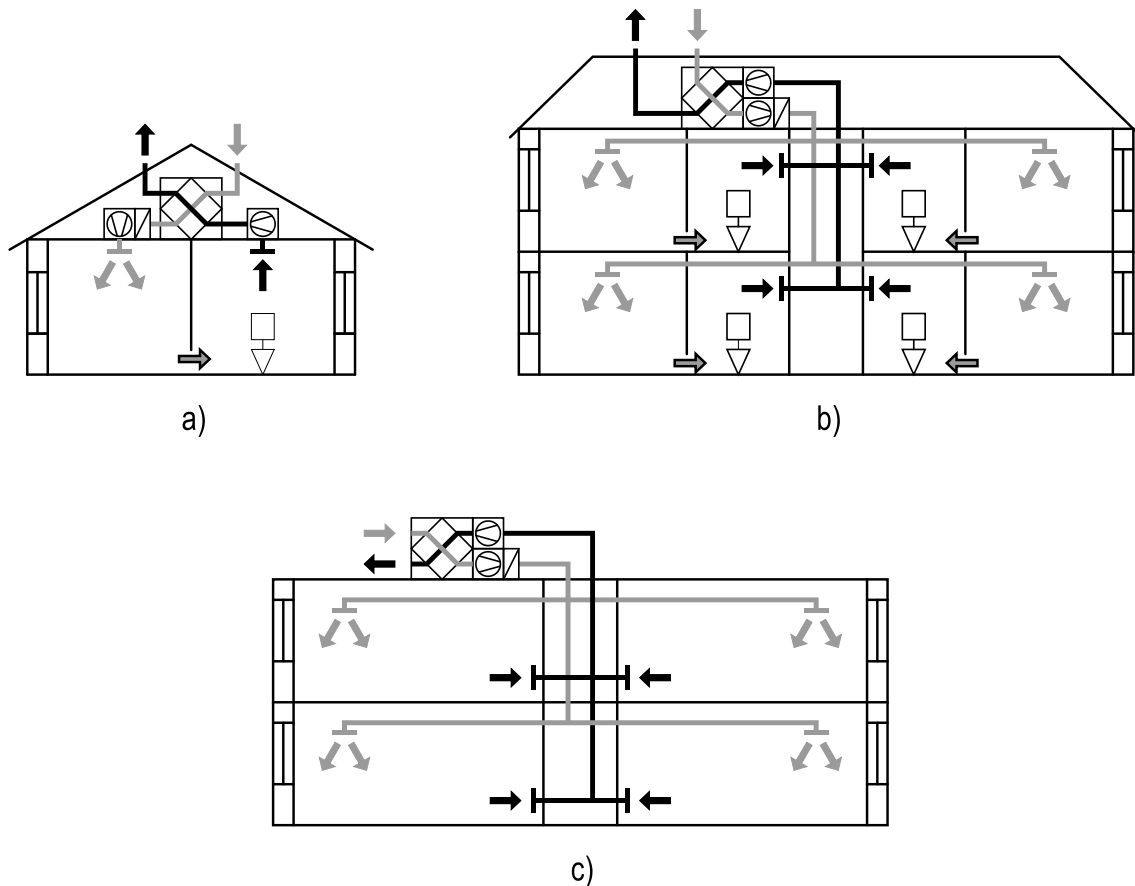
Ventilation system 3C2: a) house; b) apartment building; c) office building
